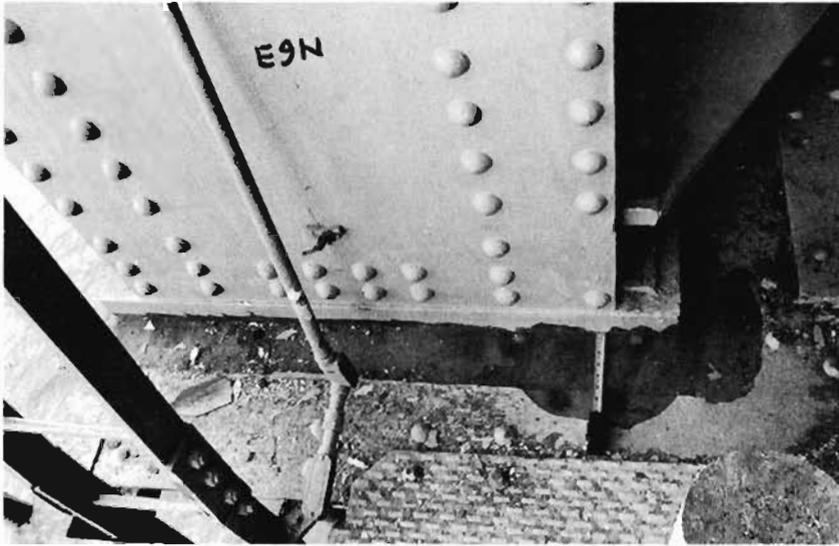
Anchor shoe on top of the northeast column of Tower E9 after the earthquake.
